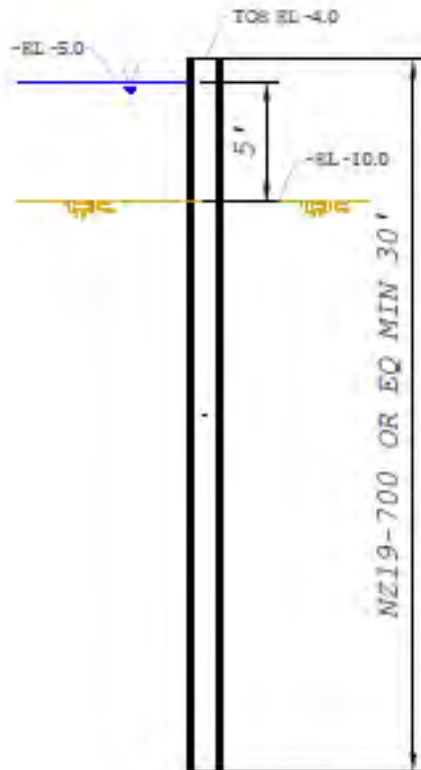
PROPOSED SHEET PILE COFFERDAM – TYPICAL SECTION
